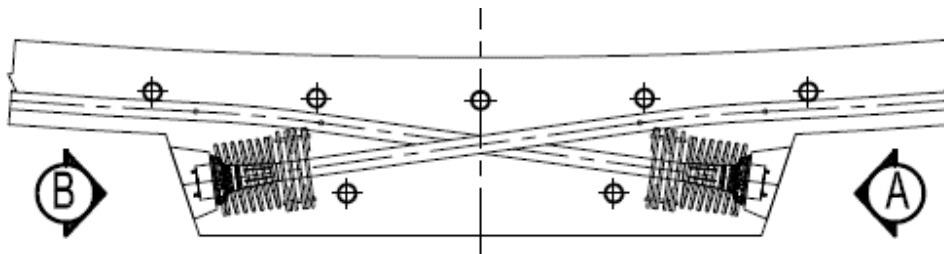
BUTTRESS PLAN ARRANGEMENT
